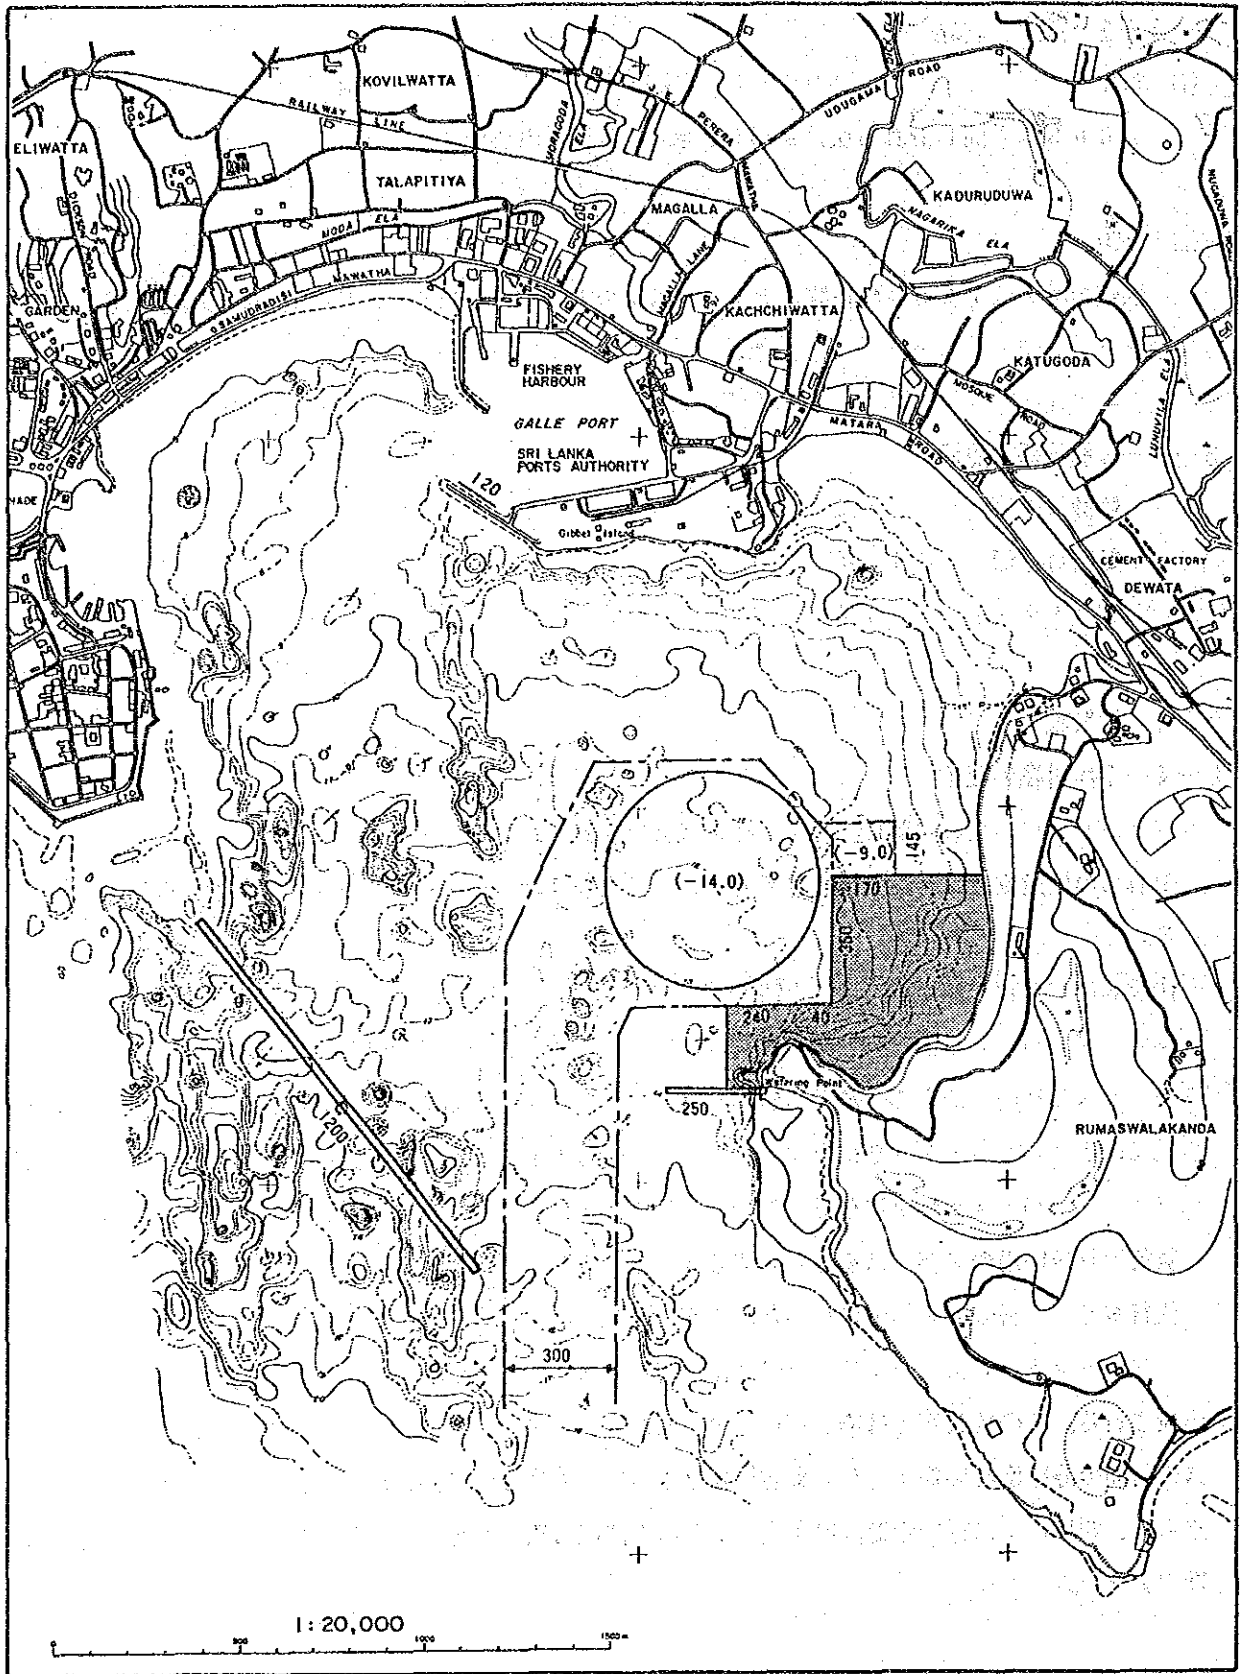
Short Term Development Plan (Alternative 1)
